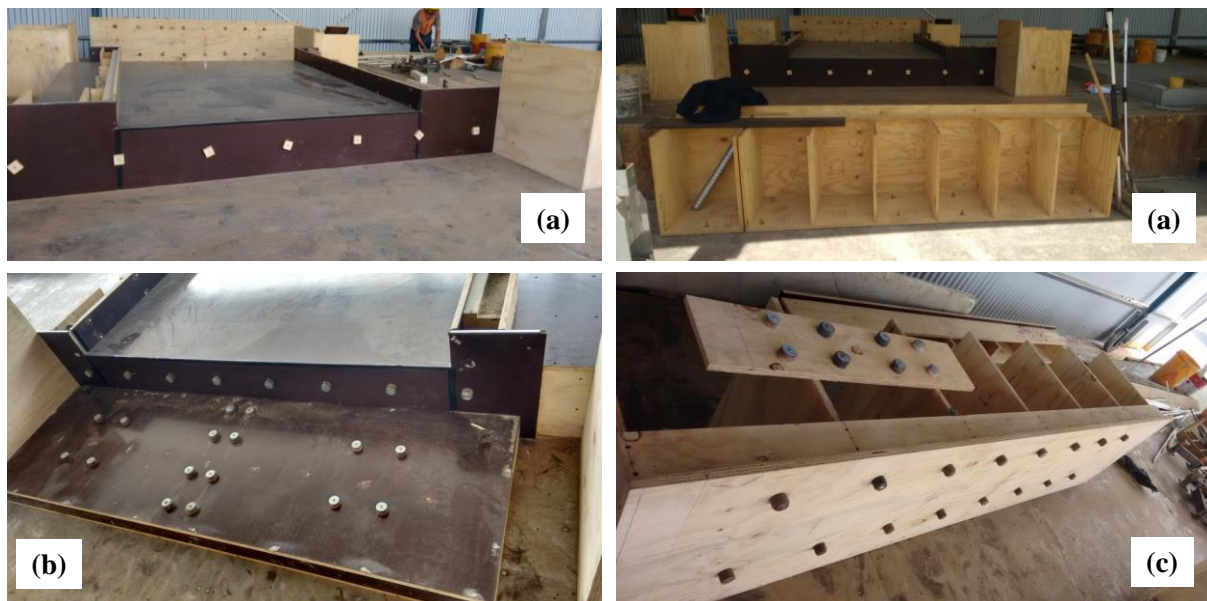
The formwork used for the specimens, (a) the mould, (b) the rubbers used for cap beam's drossbachs and (c) the rubbers used for the foundation's drossbachs
